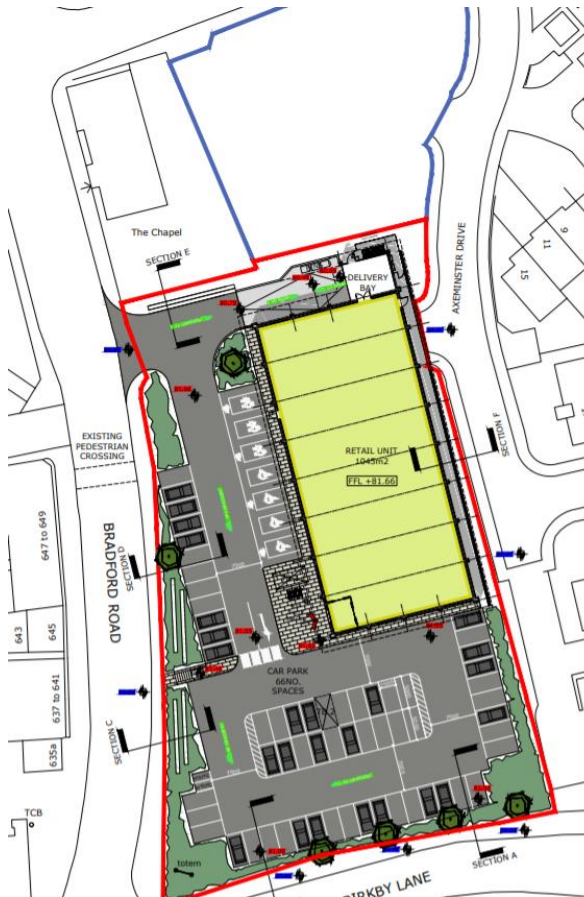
Layout and phasing plan for proposal 18/00017/OUT
